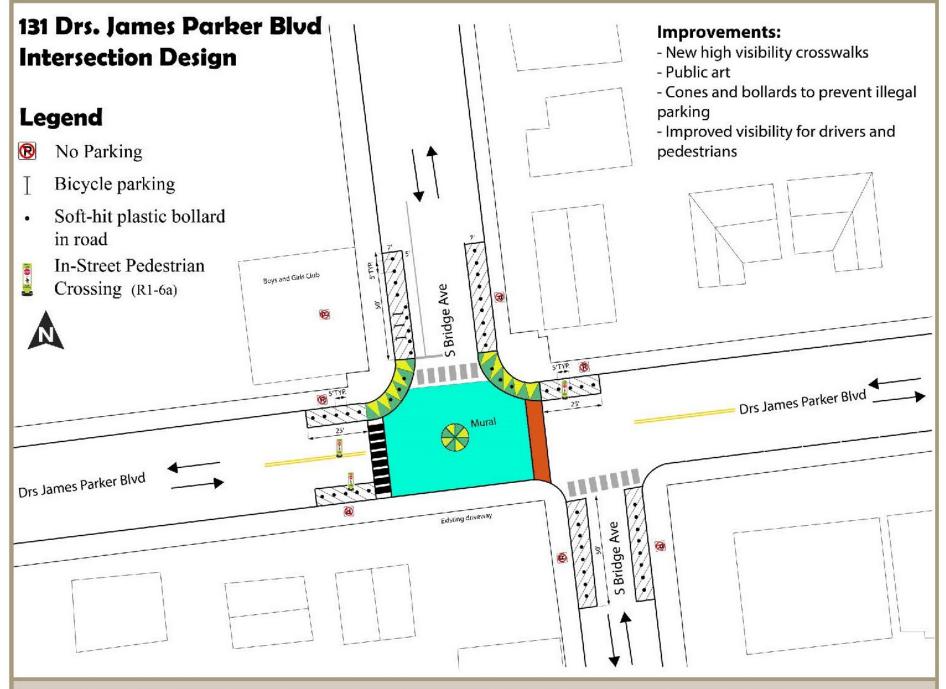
Intersection design for the Drs. James Parker Boulevard and South Bridge Avenue Demonstration Project.
